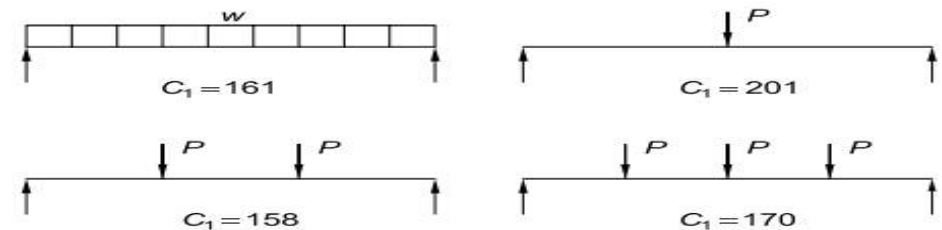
Loading constants for use in determining simple beam deflections.
